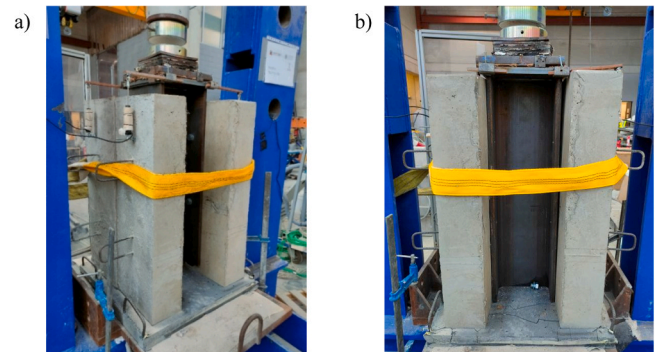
Test P15.1-T20: a) specimen before test; b) specimen after failure.
